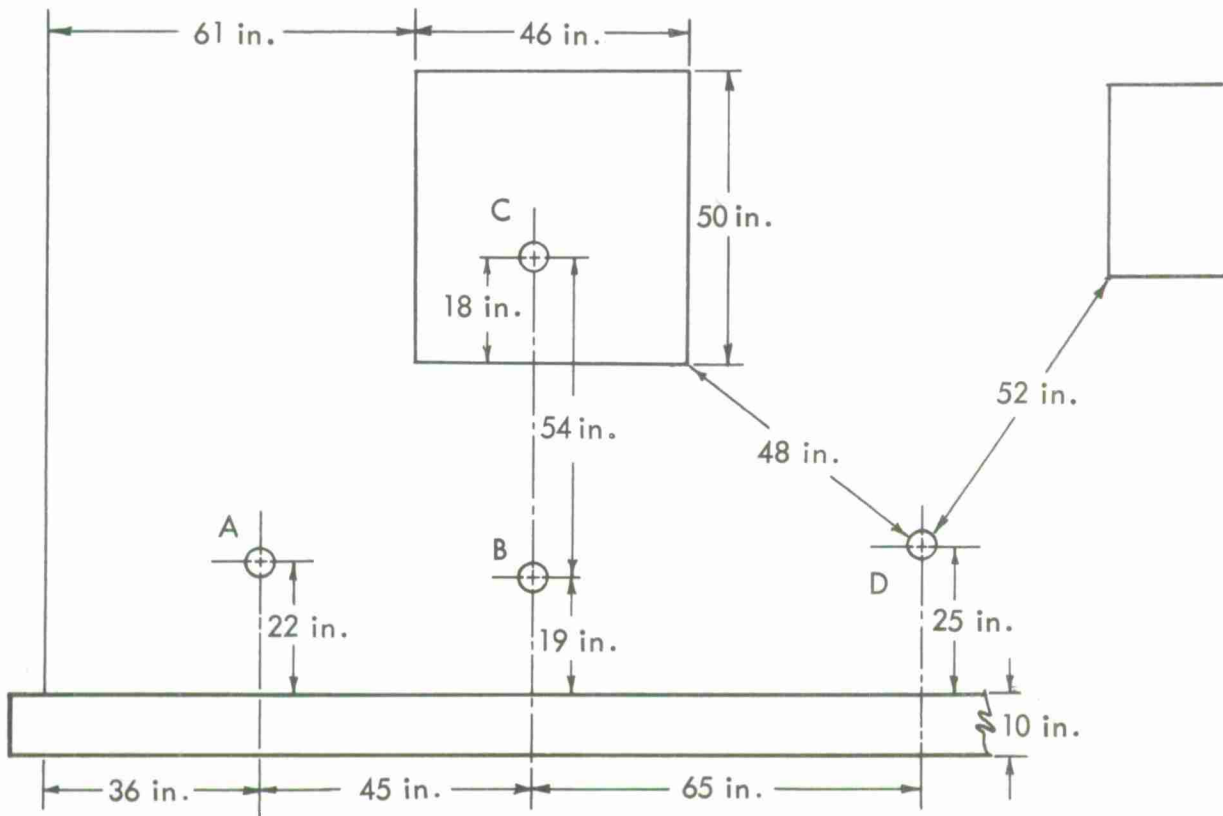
Sketch Showing Location of Gages, West Side of House
